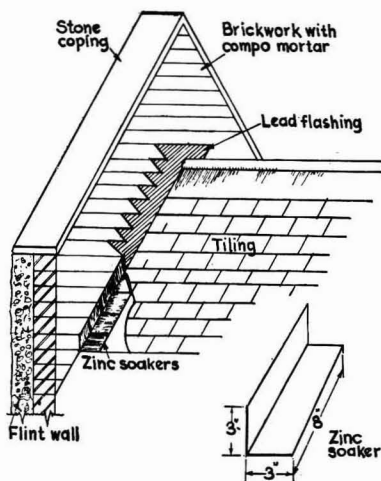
Zinc soakers at junction of roof with abutment wall
